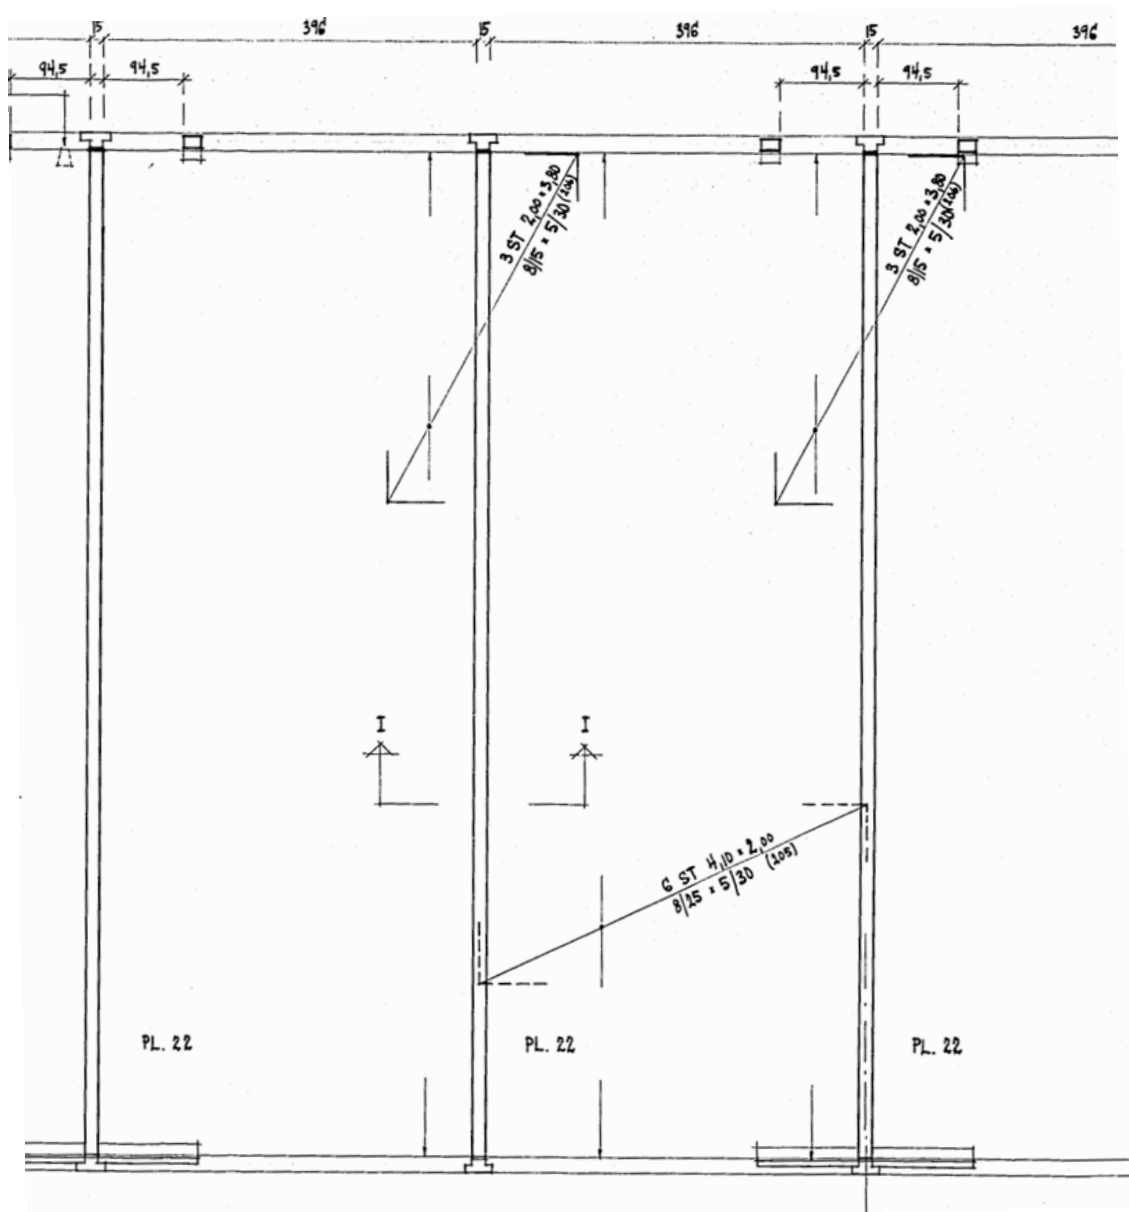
Picture from the original Cykelskrapan structural drawing showing the location of section I-I. Source: Lund City Archives.
